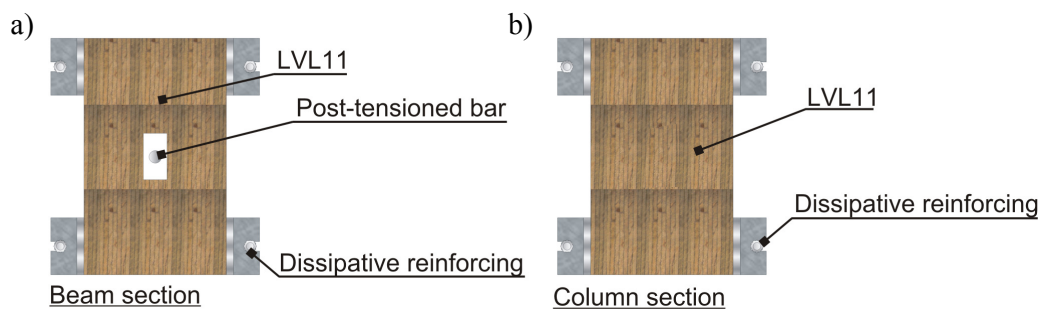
Example of typical a) beam and b) column used for parametric analysis of post-tensioned timber frames.
